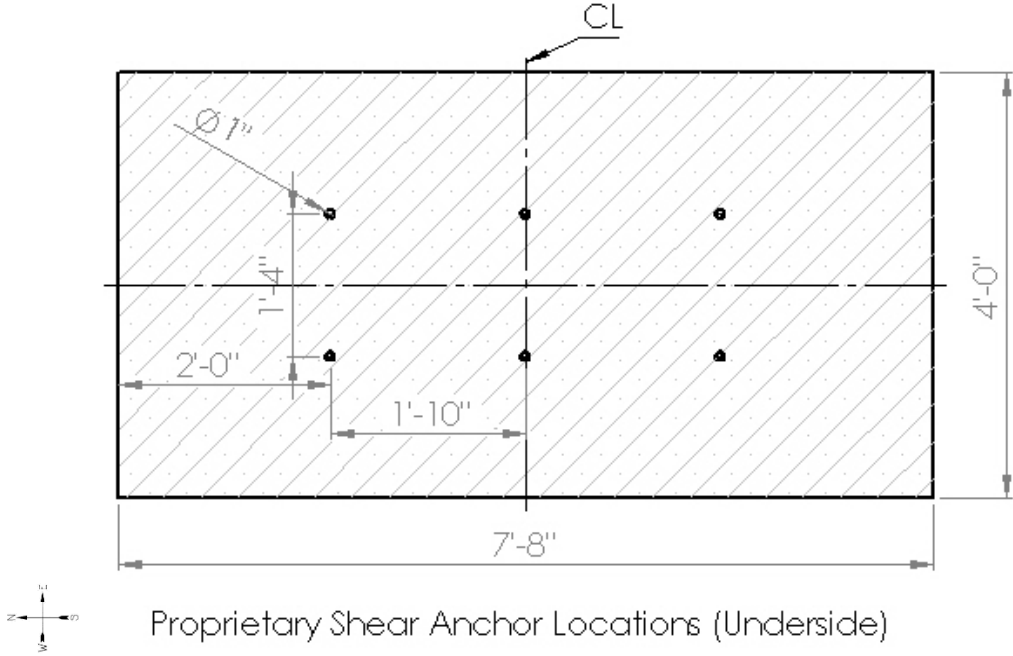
Schematic drawing of shear anchor placement. (plan view)
